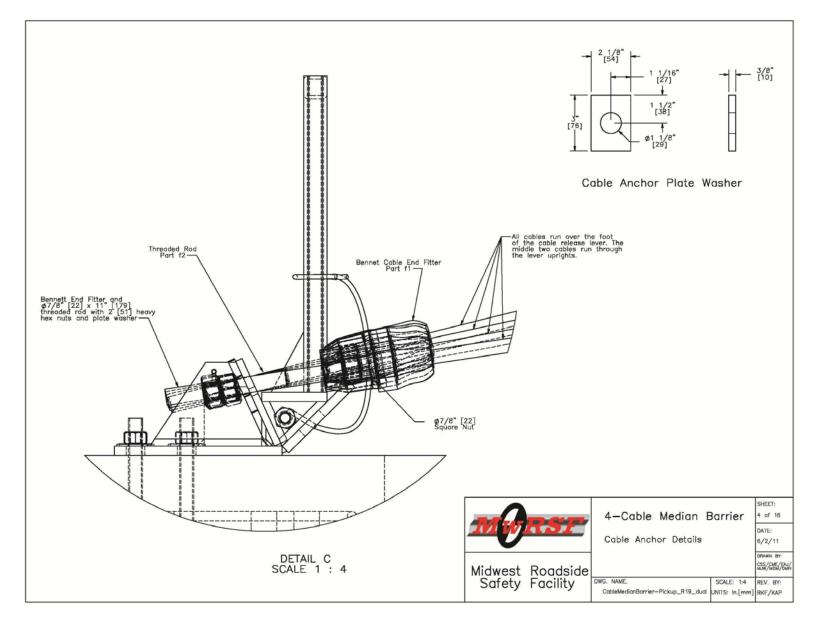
Cable Anchor Details, Test No. 4CMB-1
